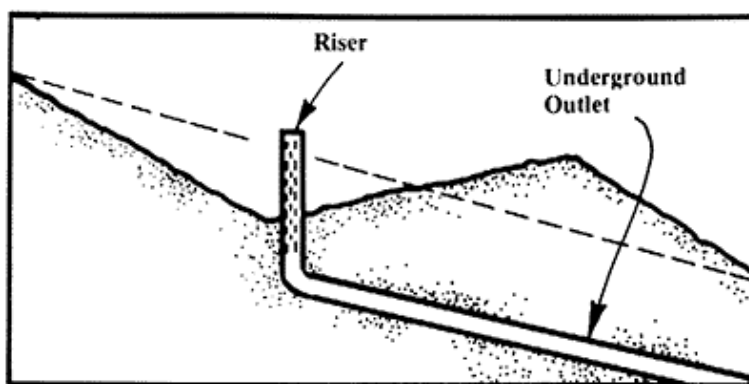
Typical Inlet Arrangement of Underground Outlet
